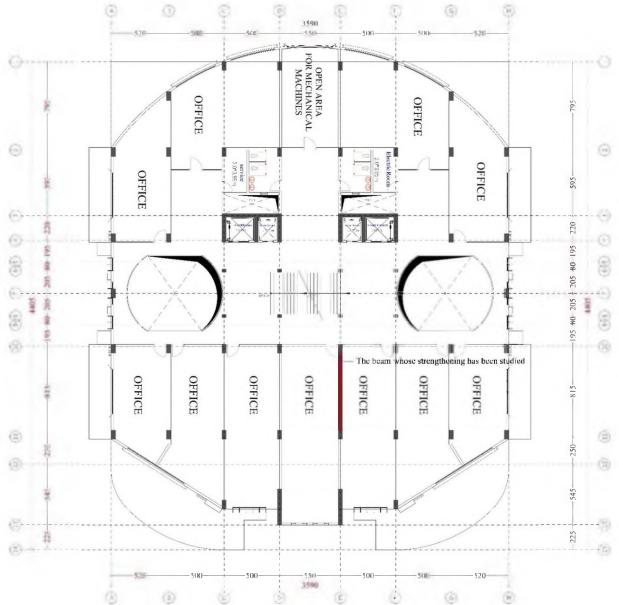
Plan for the sixth floor Indicates the location of the beam to be studied
